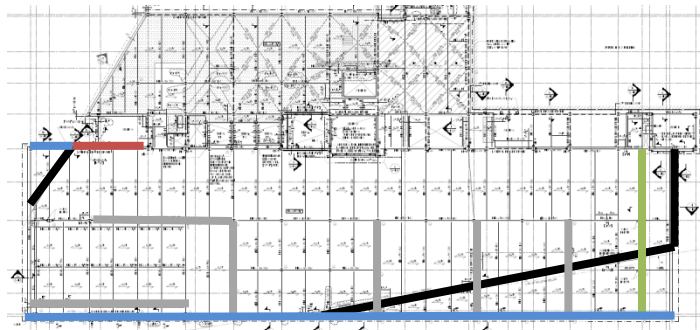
Level 5 framing plan showing regular layout against building footprint (S-105)
